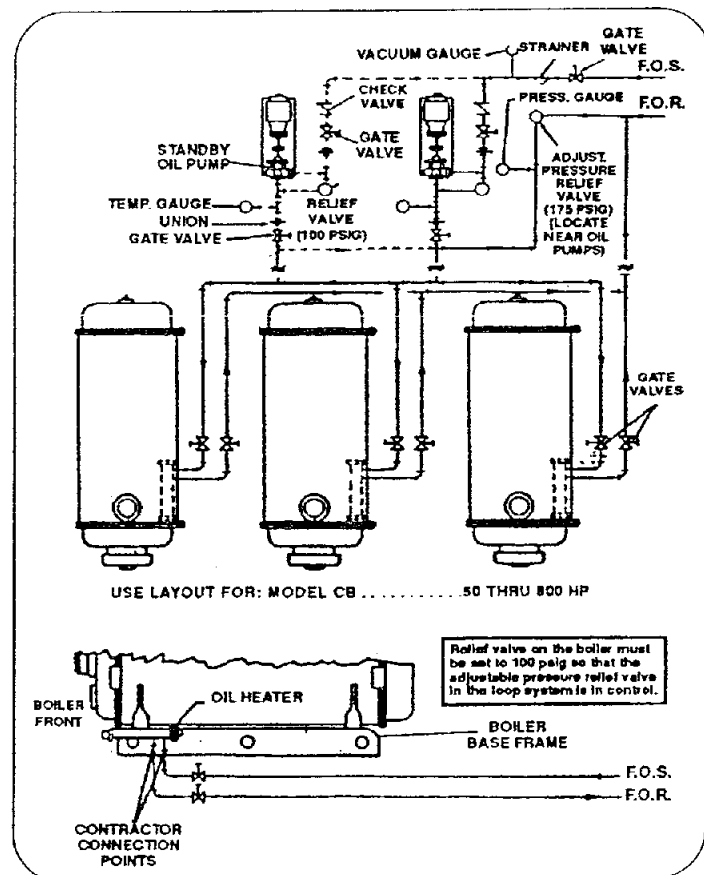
No. 6 Oil Piping, Multiple Boiler Installation
